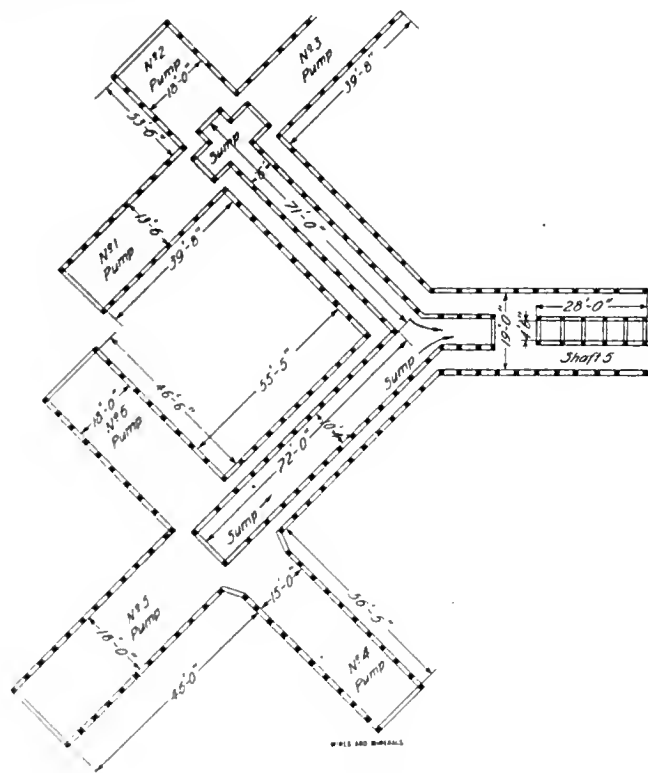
PLAN OF PUMPING STATION, JUNCTION SHAFT
